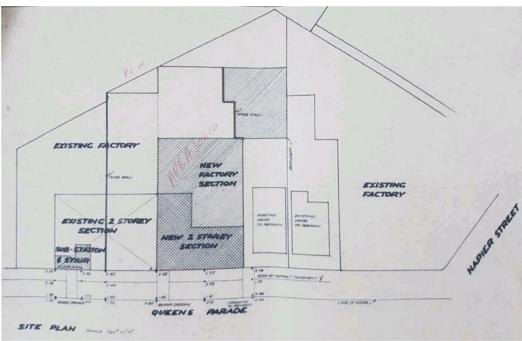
1965 drawings – site plan of the 1965 extensions to the complex (PROV, 12 March 1965).
